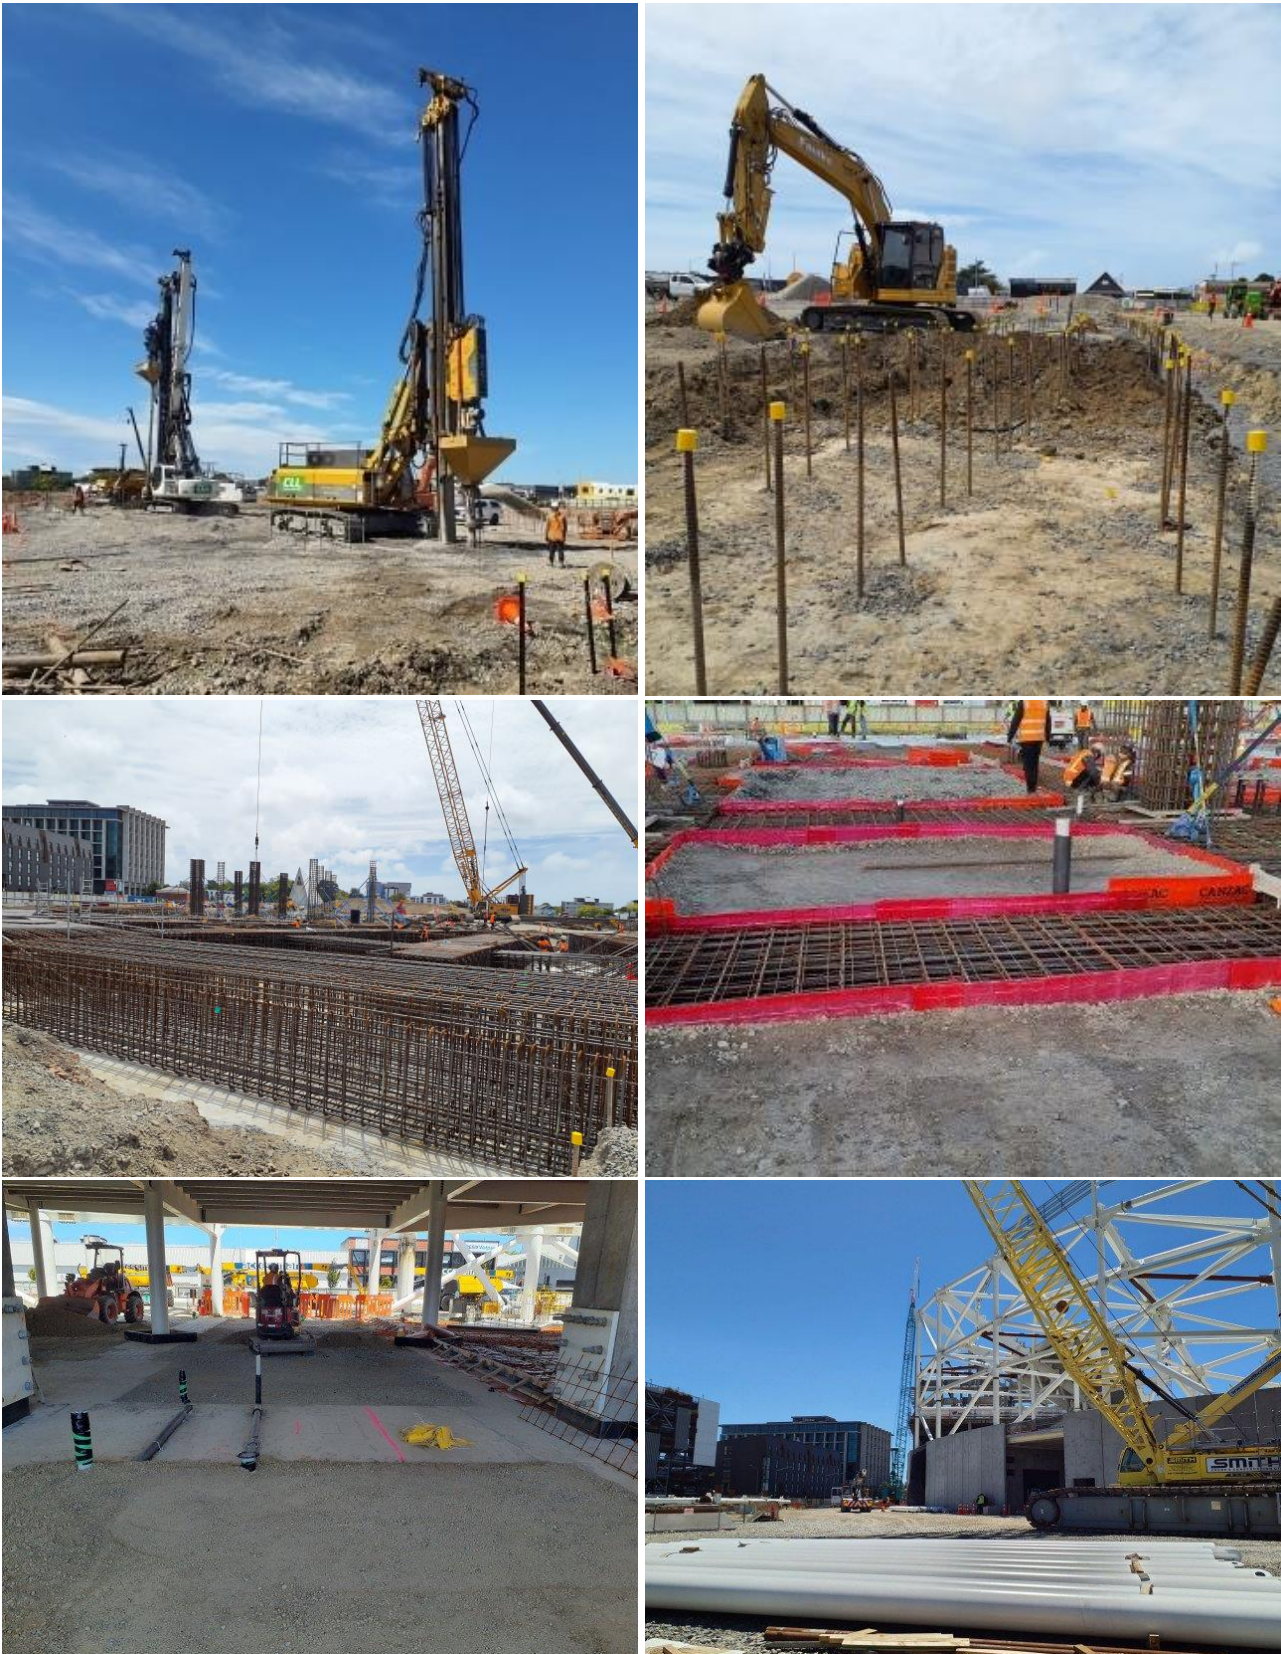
From top left to bottom right: RAP construction; excavation of ground beams and exposed subgrade; placement of steel reinforcing; infilled grillage beams; finished grillage beam pods; commencement of superstructure construction on completed foundation system.
